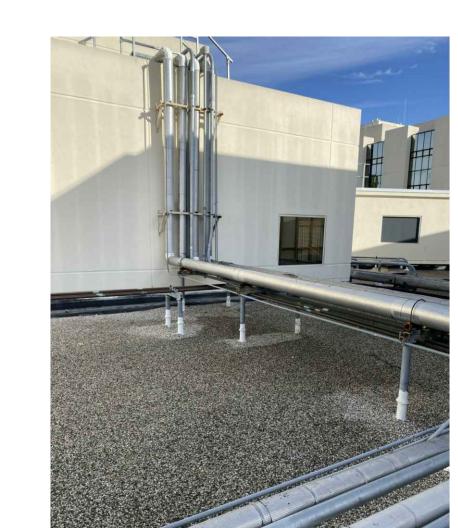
VERTICAL CONDUIT RACK FROM 1ST FLOOR ROOF TO 2ND FLOOR ROOF
